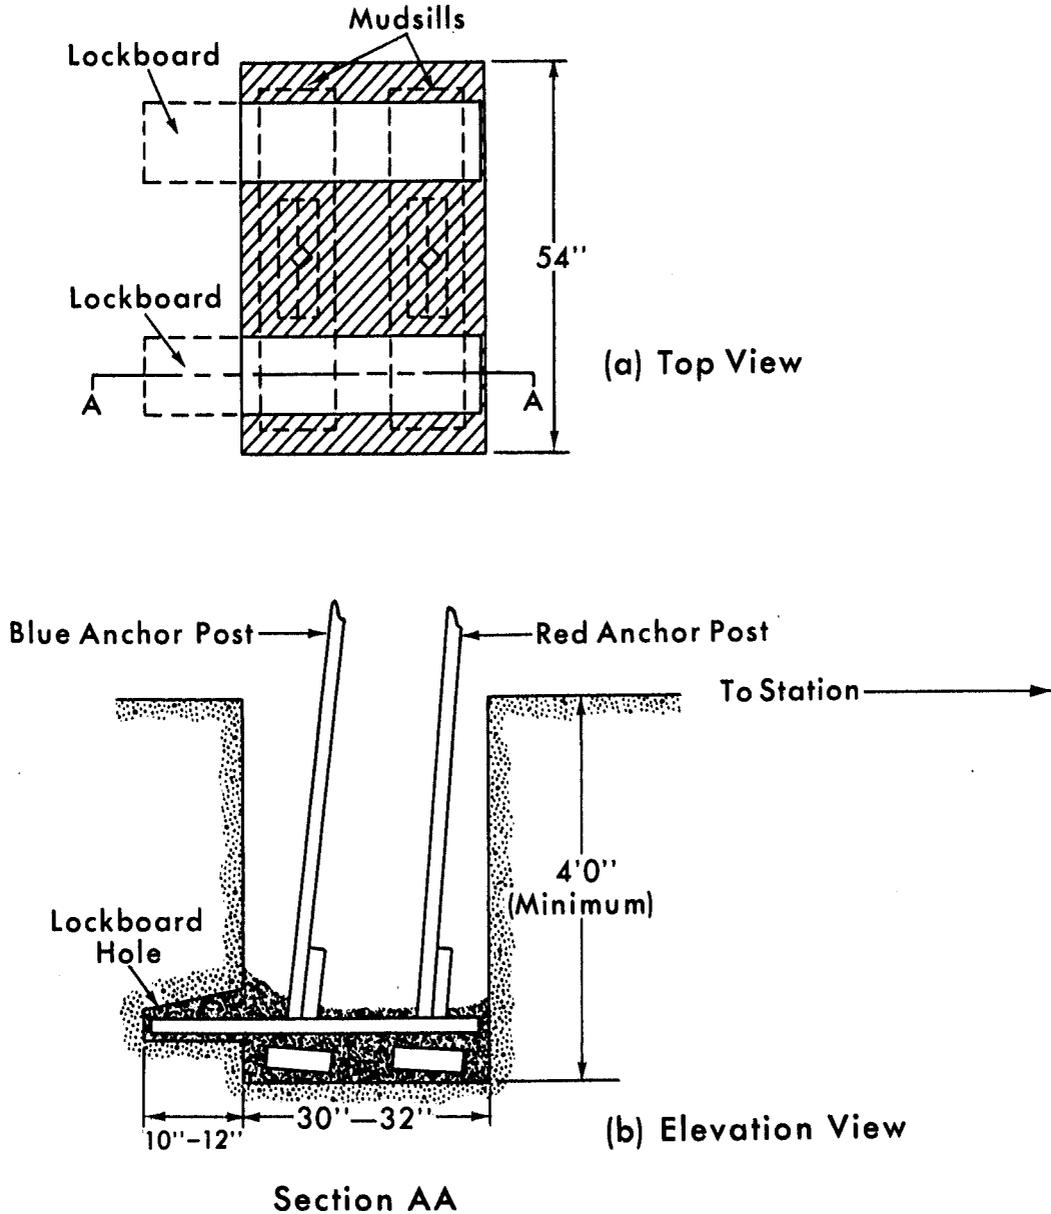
Top and elevation views of the anchor hole showing the placement of anchors and lockboards for a 90-ft. tower.
